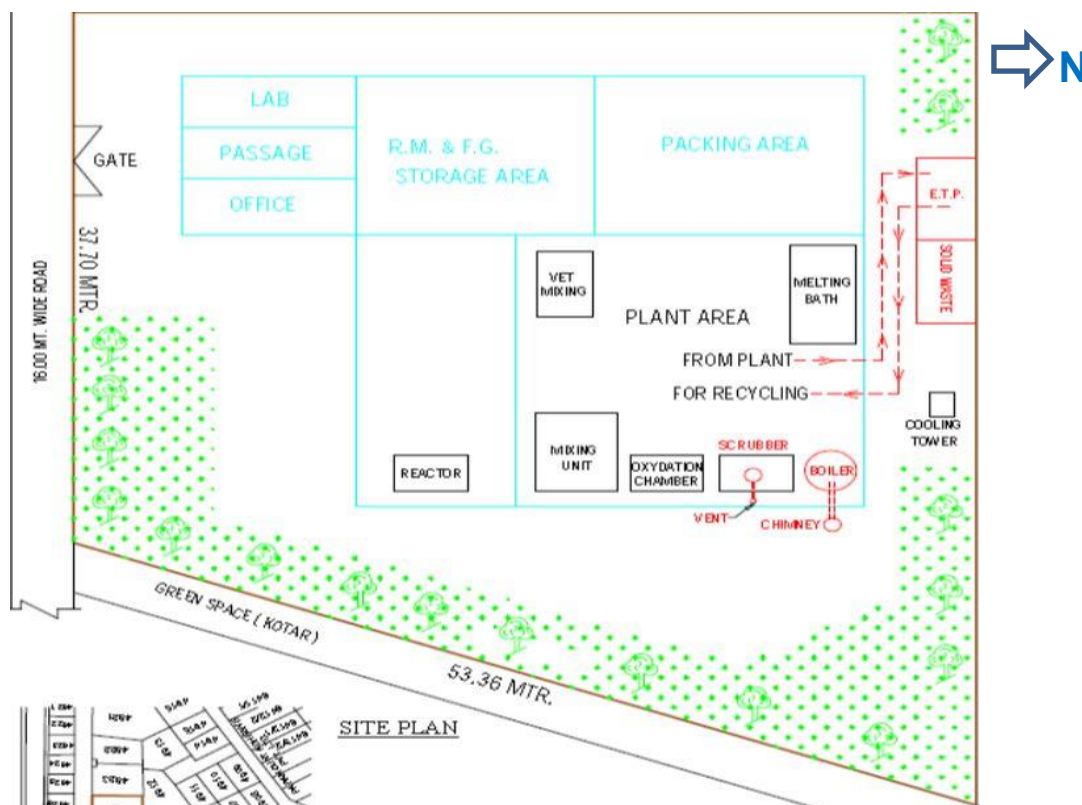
Plant facility showing all the storages, manufacturing plant area and the buildings.
